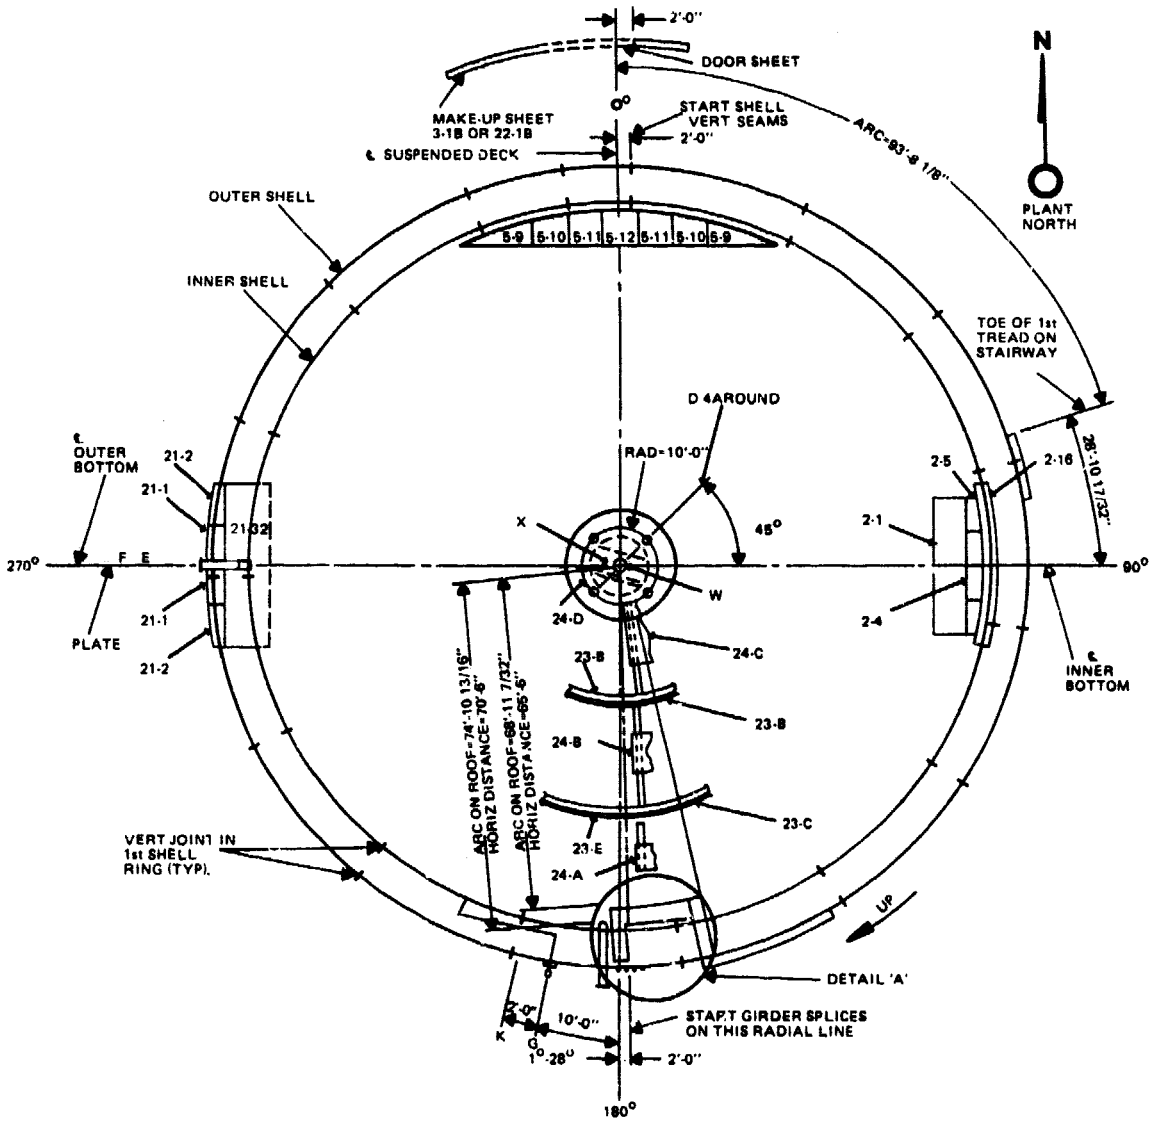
PLAN VIEW OF A TYPICAL DOUBLE WALLED STEEL LNG STORAGE
